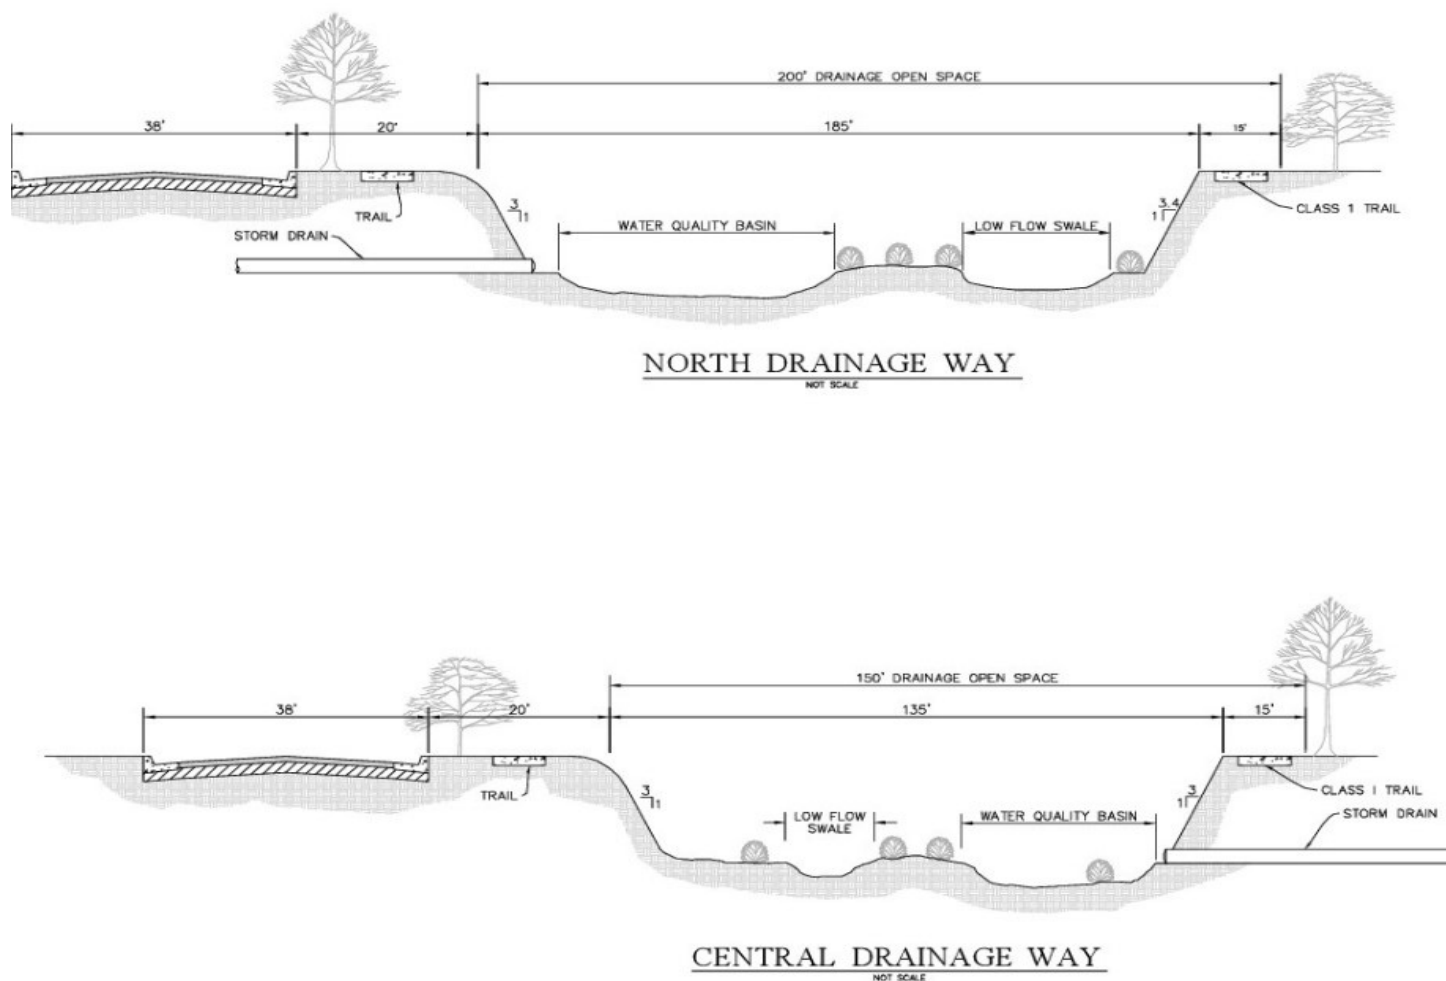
Illustrative Cross Sections of North and Central Drainage Ways
